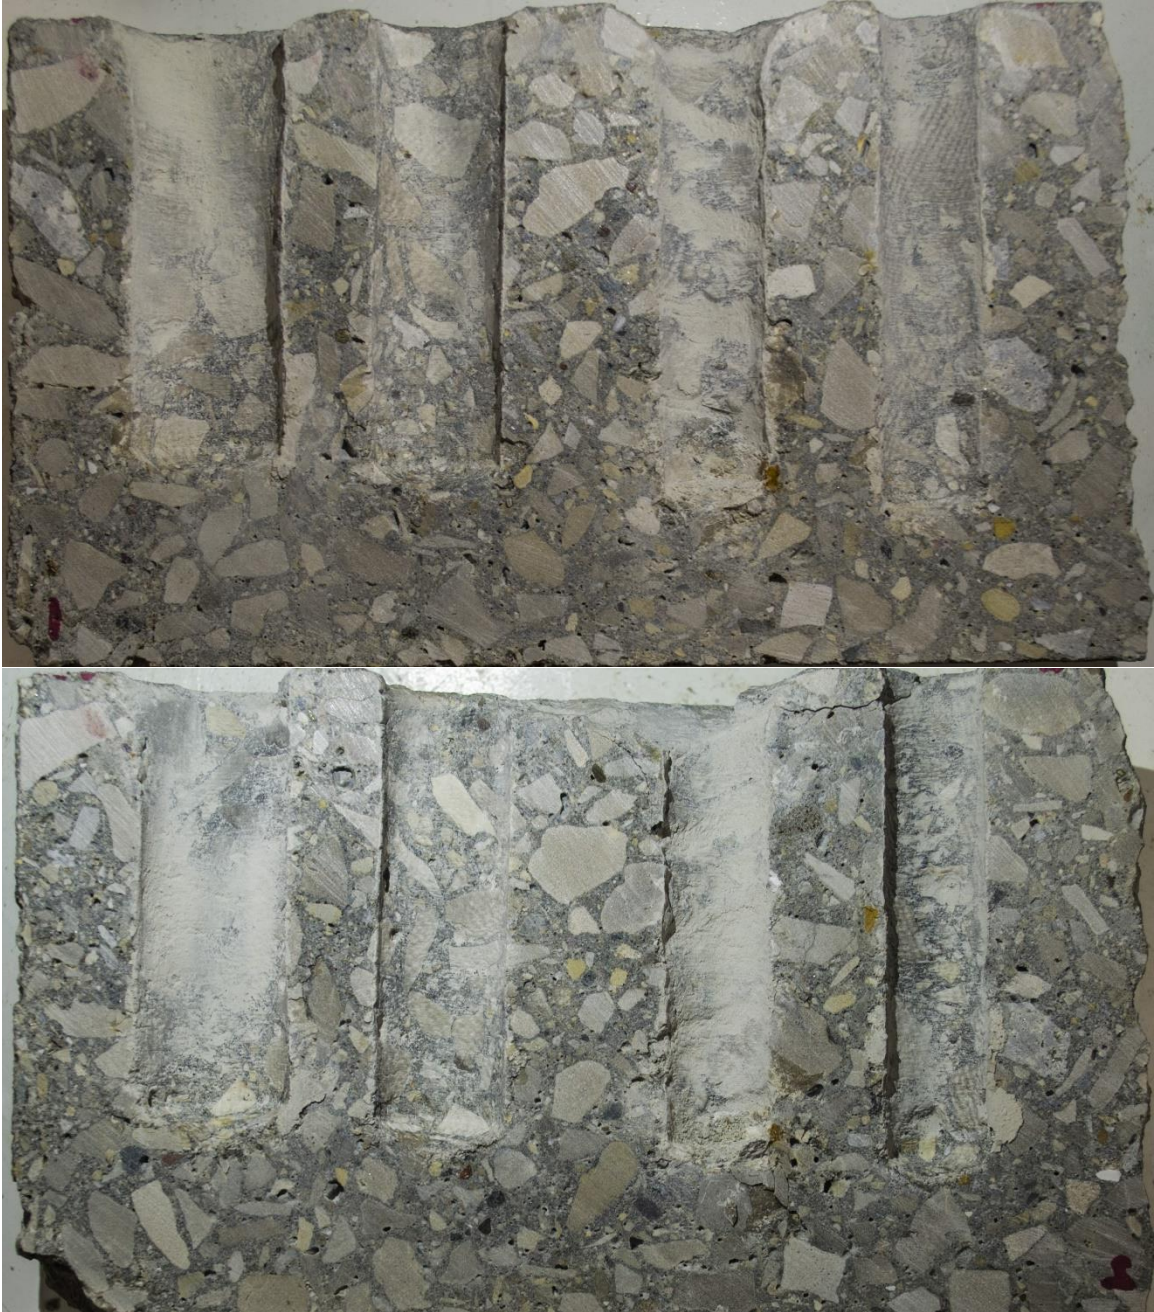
Dust left at bottom of hole after cleaning using compressed air at the top
